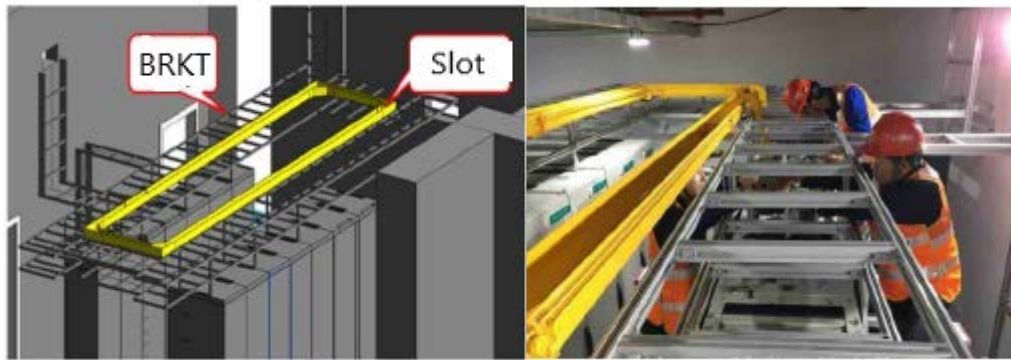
Machine Room Cabinet and Wire Trunking Placement Process
